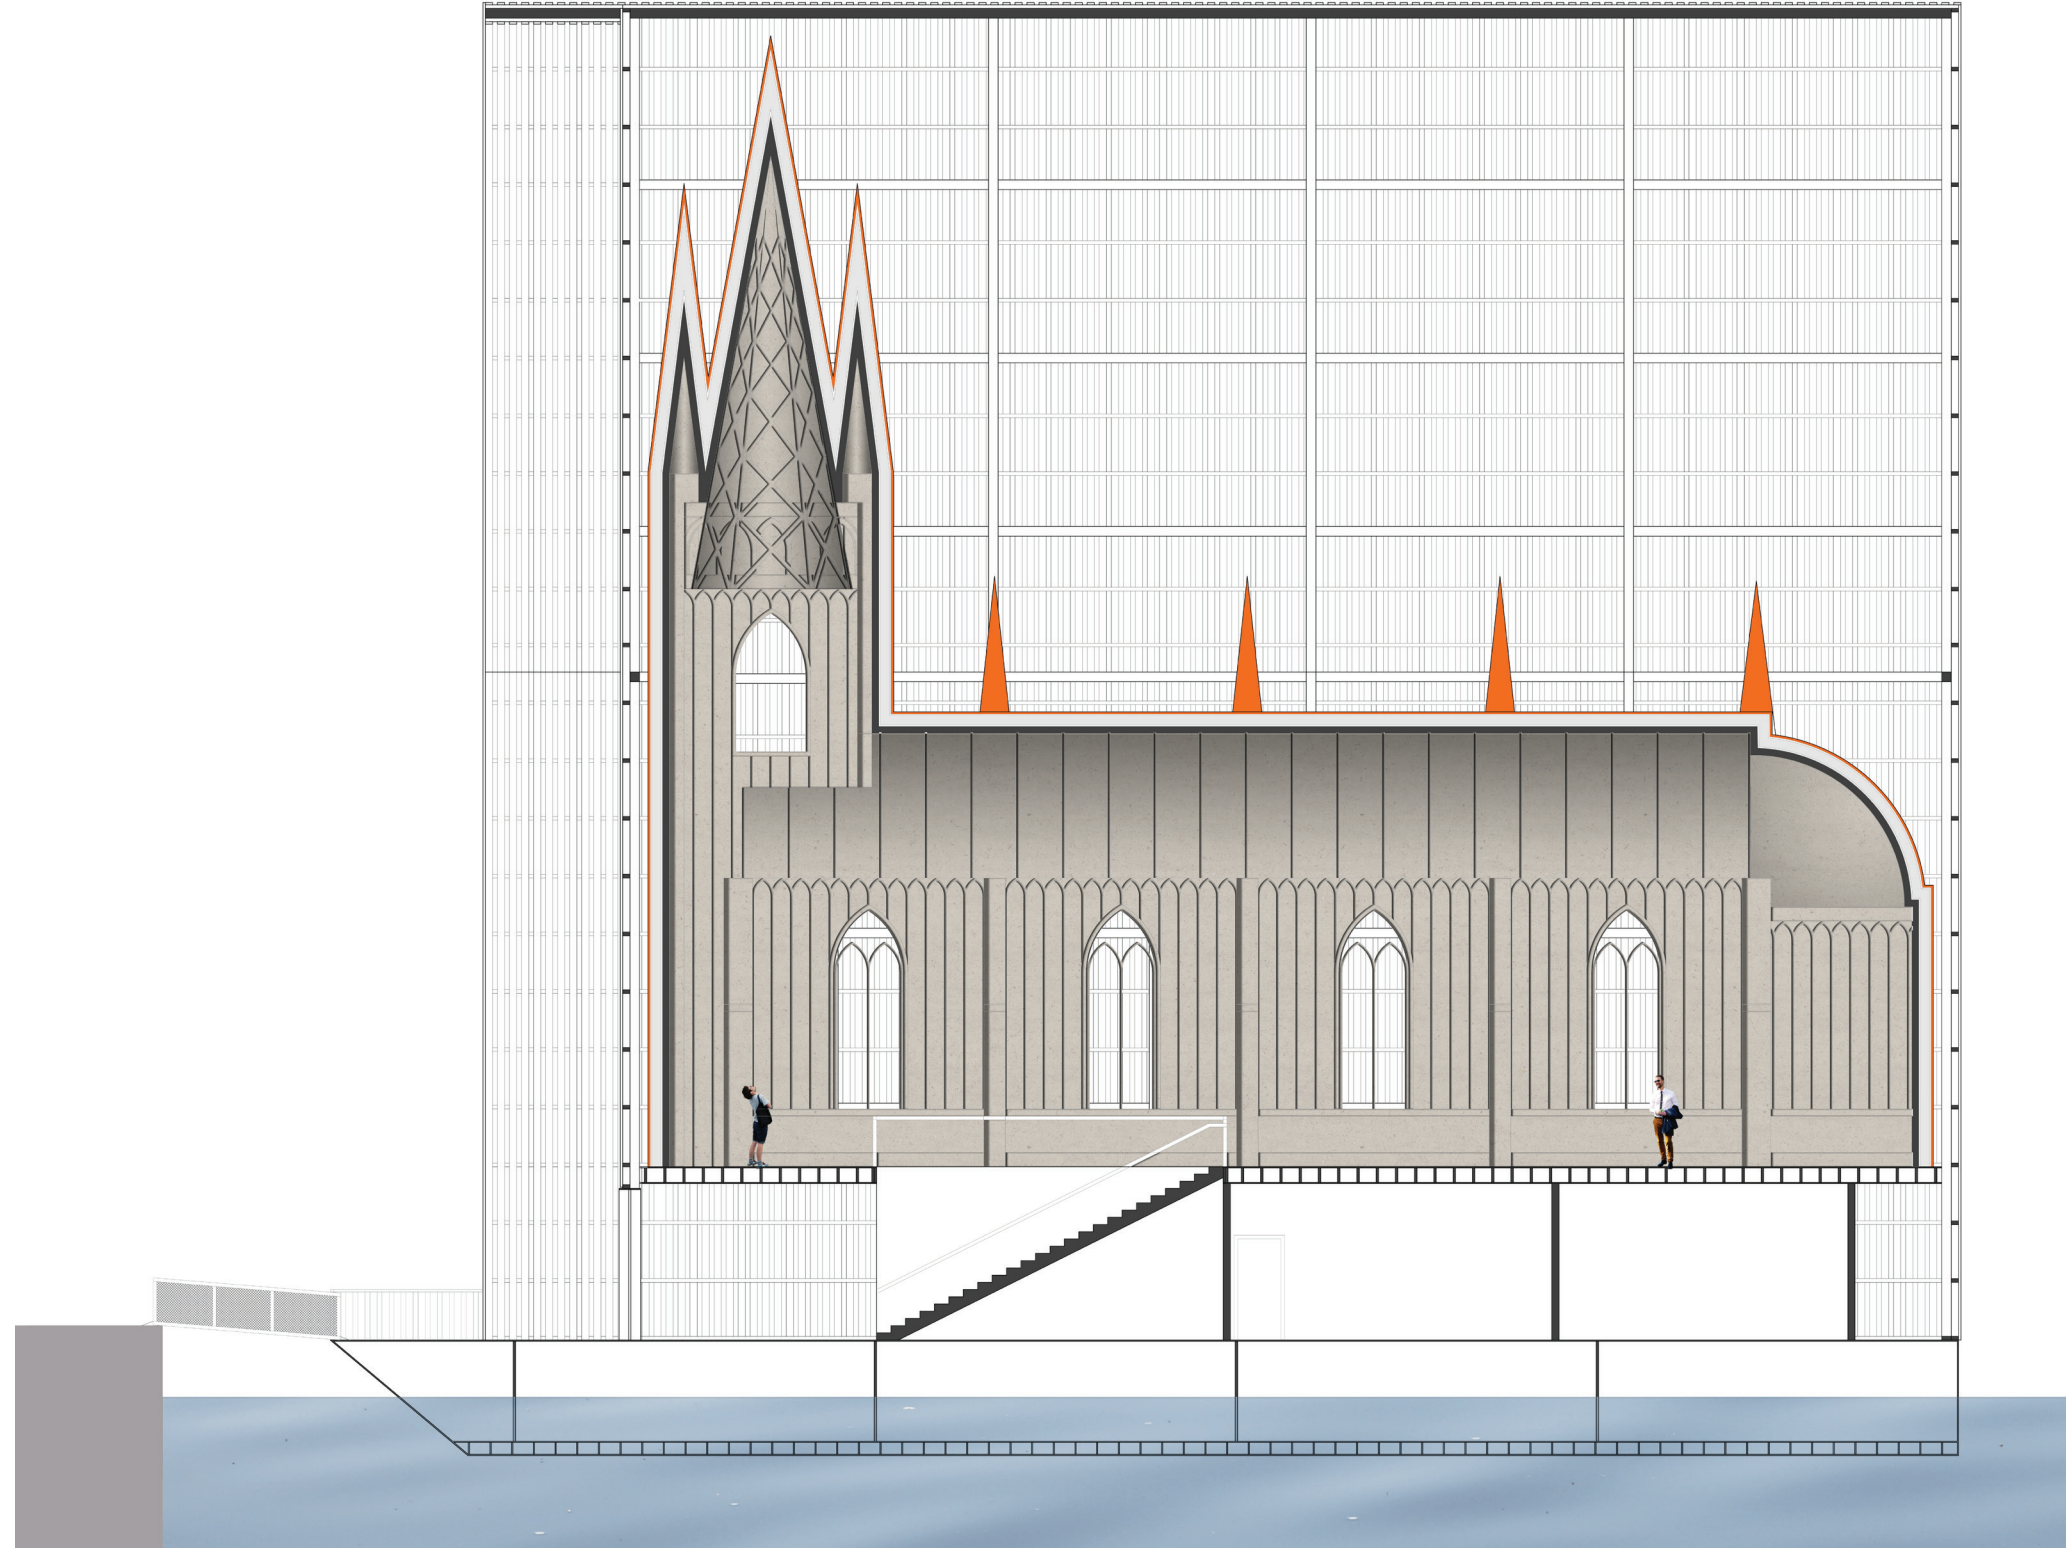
Floating Church of the Redeemer Reconstruction Section.
